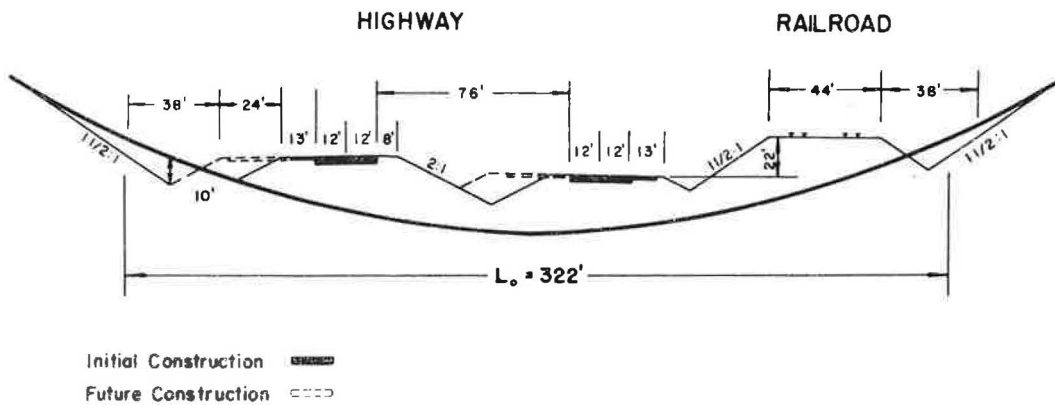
Typical cross section of final roadbeds proposed for Project Carryall.
